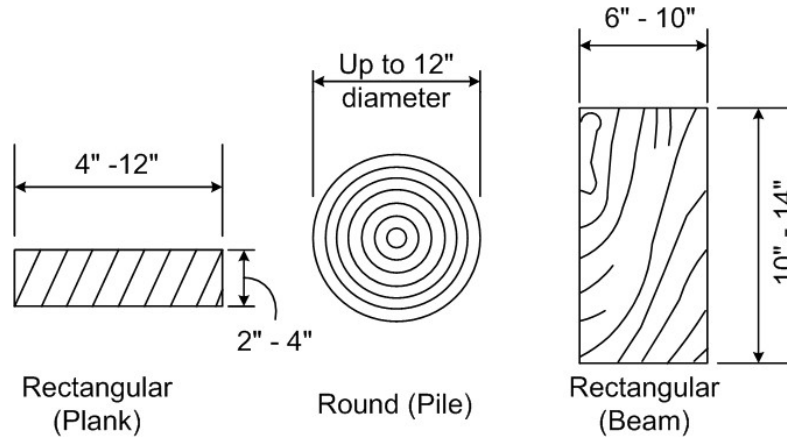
Timber Members with Typical Dimensions for Bridges
